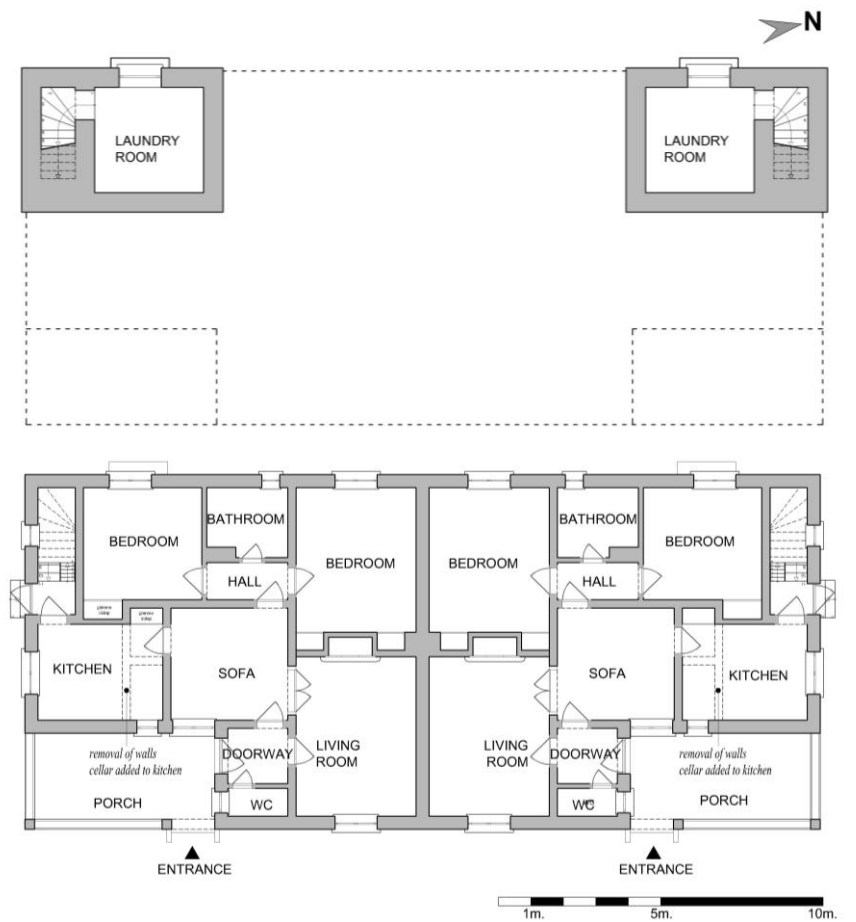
Basement and ground floor plans of Employee Dwelling Type 7
